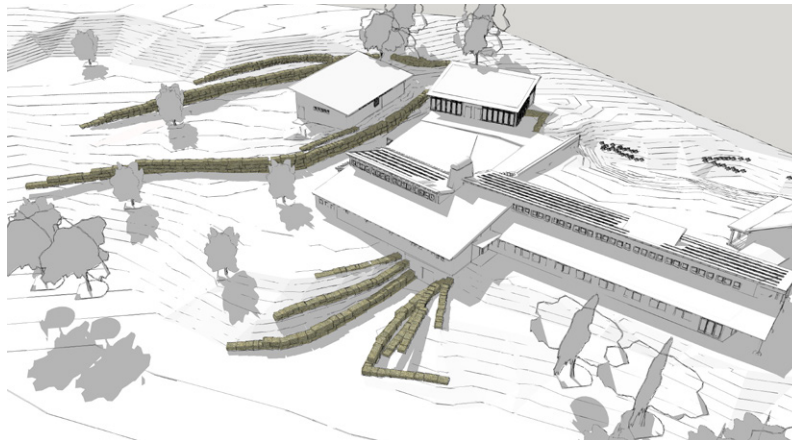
Rendering of ALF Highlighting Masonry Retaining Walls
